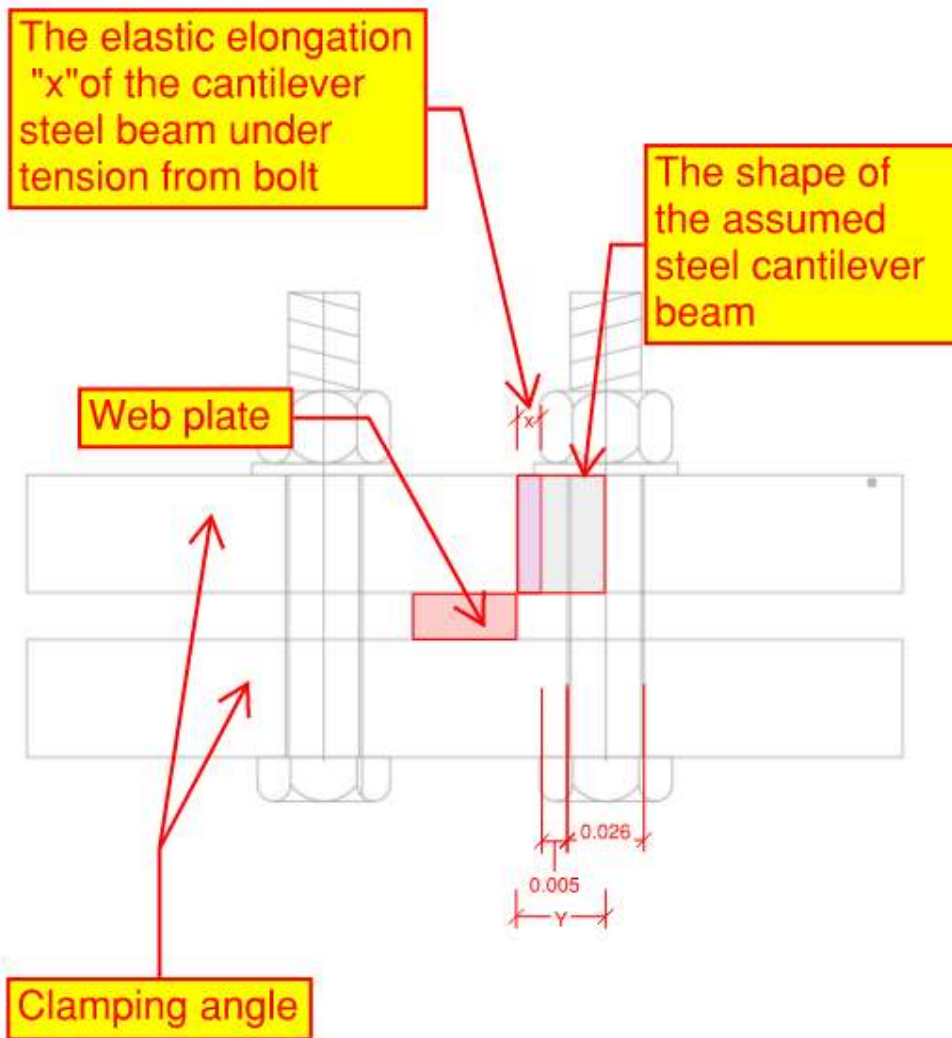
Dimensions for the steel cantilever part in calculation-inside view
